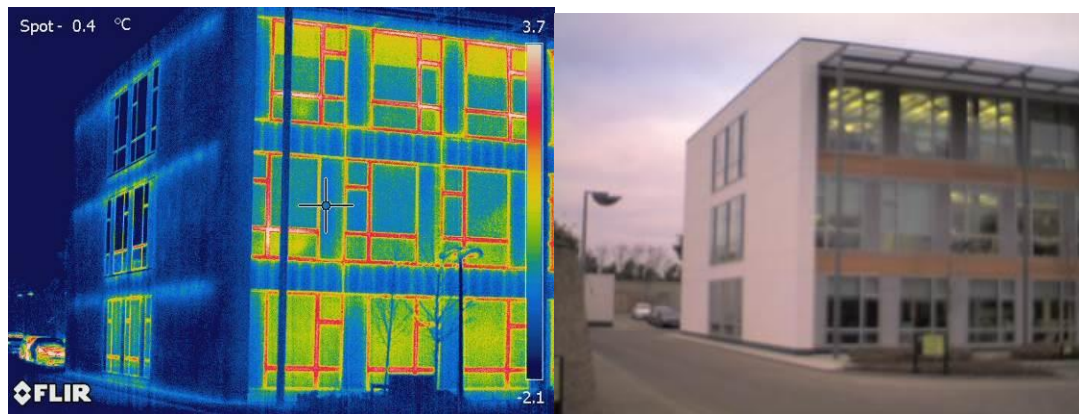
Thermal image of external left side gable end elevation and location photograph
